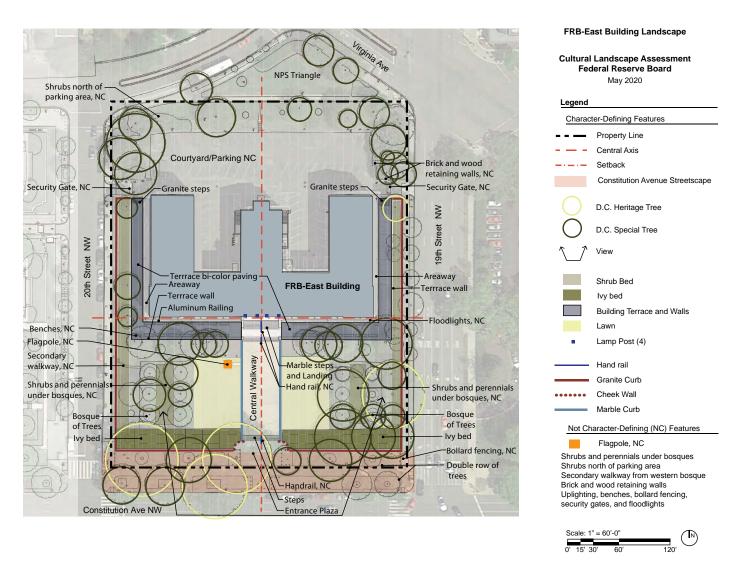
Character-defining features of the FRB-East Building landscape.
